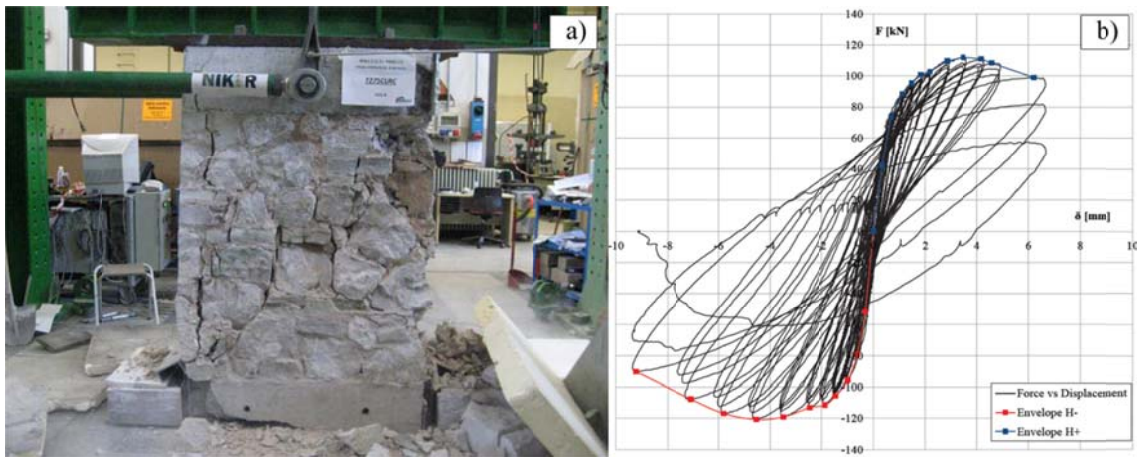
Cyclic test on stone masonry panel: specimen after failure (a) and hysteretic loops (b) (NIKER Project 2011).
